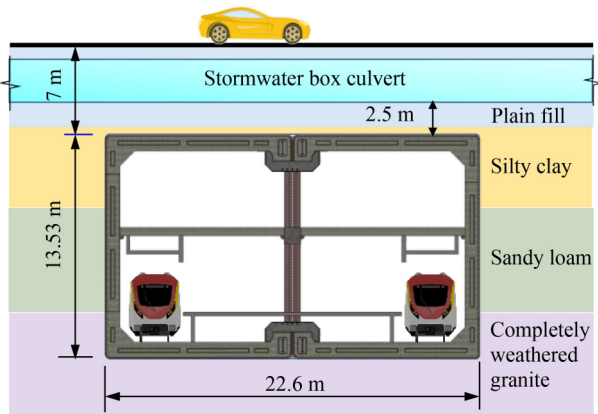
Cross-sectional view of the pipe jacking section at Shasan station.
